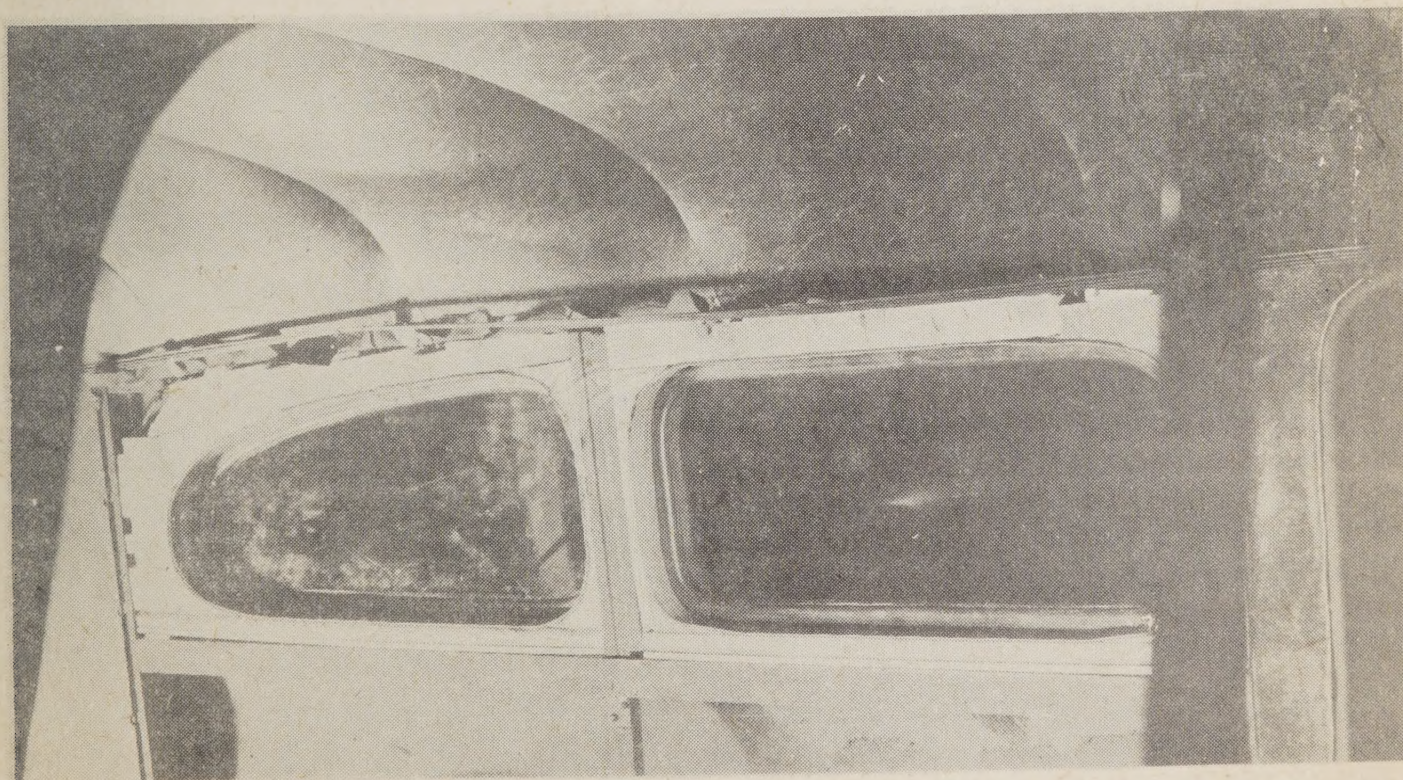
Completed interior installation, showing casing and linoleum strip in place prior to replacing fiberboard wall.
